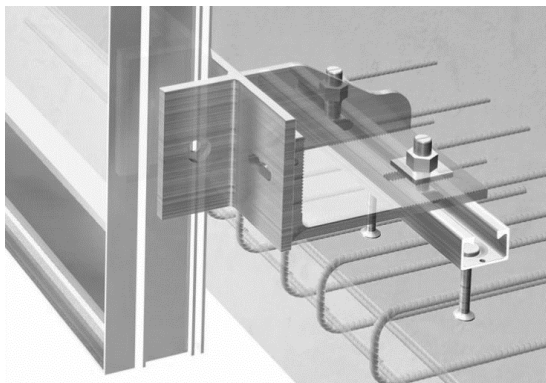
Connection of curtain wall elements using anchor channels and two adjacent channel bolts, e.g. for the façade of the Marina Bay Sands project, Singapore.
